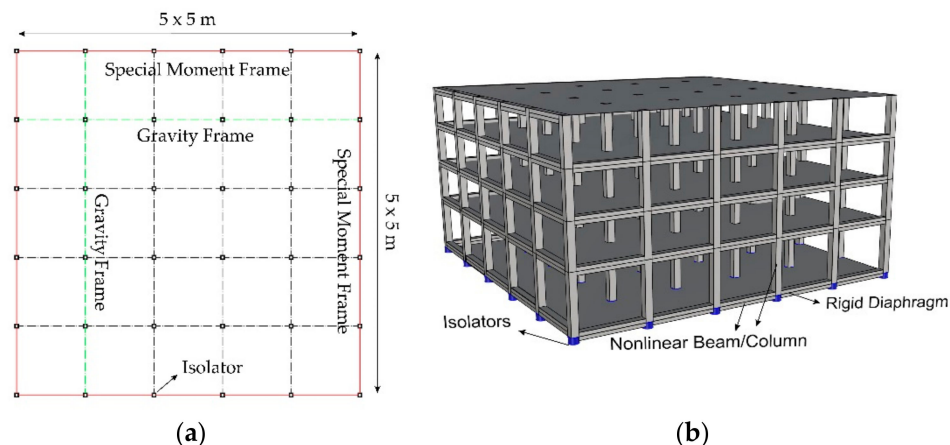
(a) Typical plan of the archetypes, (b) 3D view of 4-story isolated structures.
